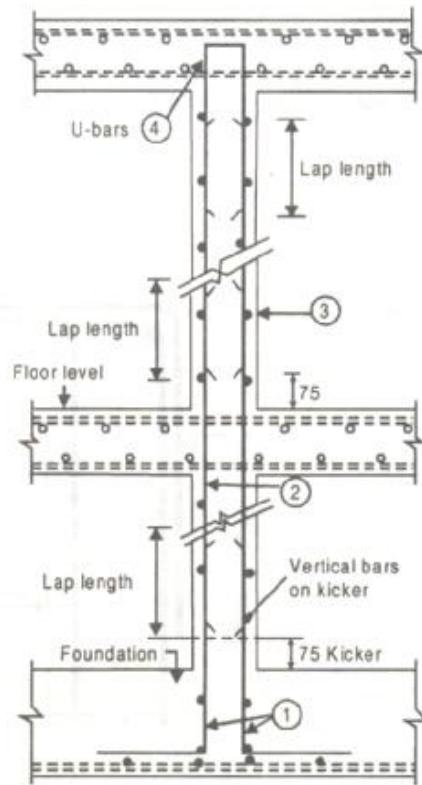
Reinforcement layout in walls (1. Foundation bars; 2. Vertical bars; 3. U-bars; 4. U-bars).
